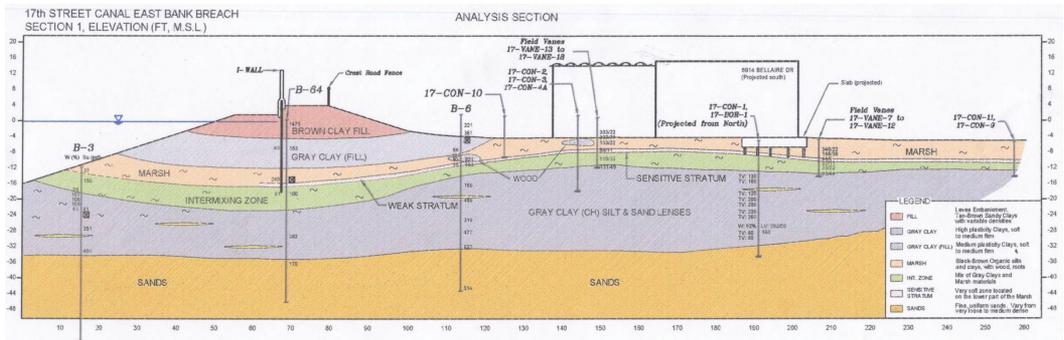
The cross section of the flood wall at 17th street canal and its foundation (Team 2006).
